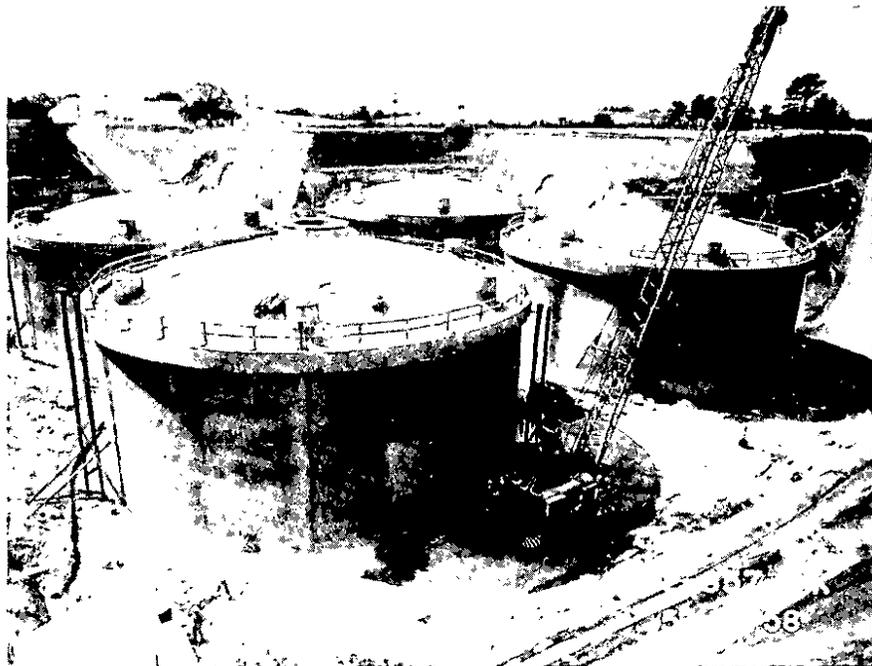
EXHIBIT XII-B COMPLETED TANKS SHOWING PILES NEAR TANK WALL PLACED PRIOR TO BACKFILLING
